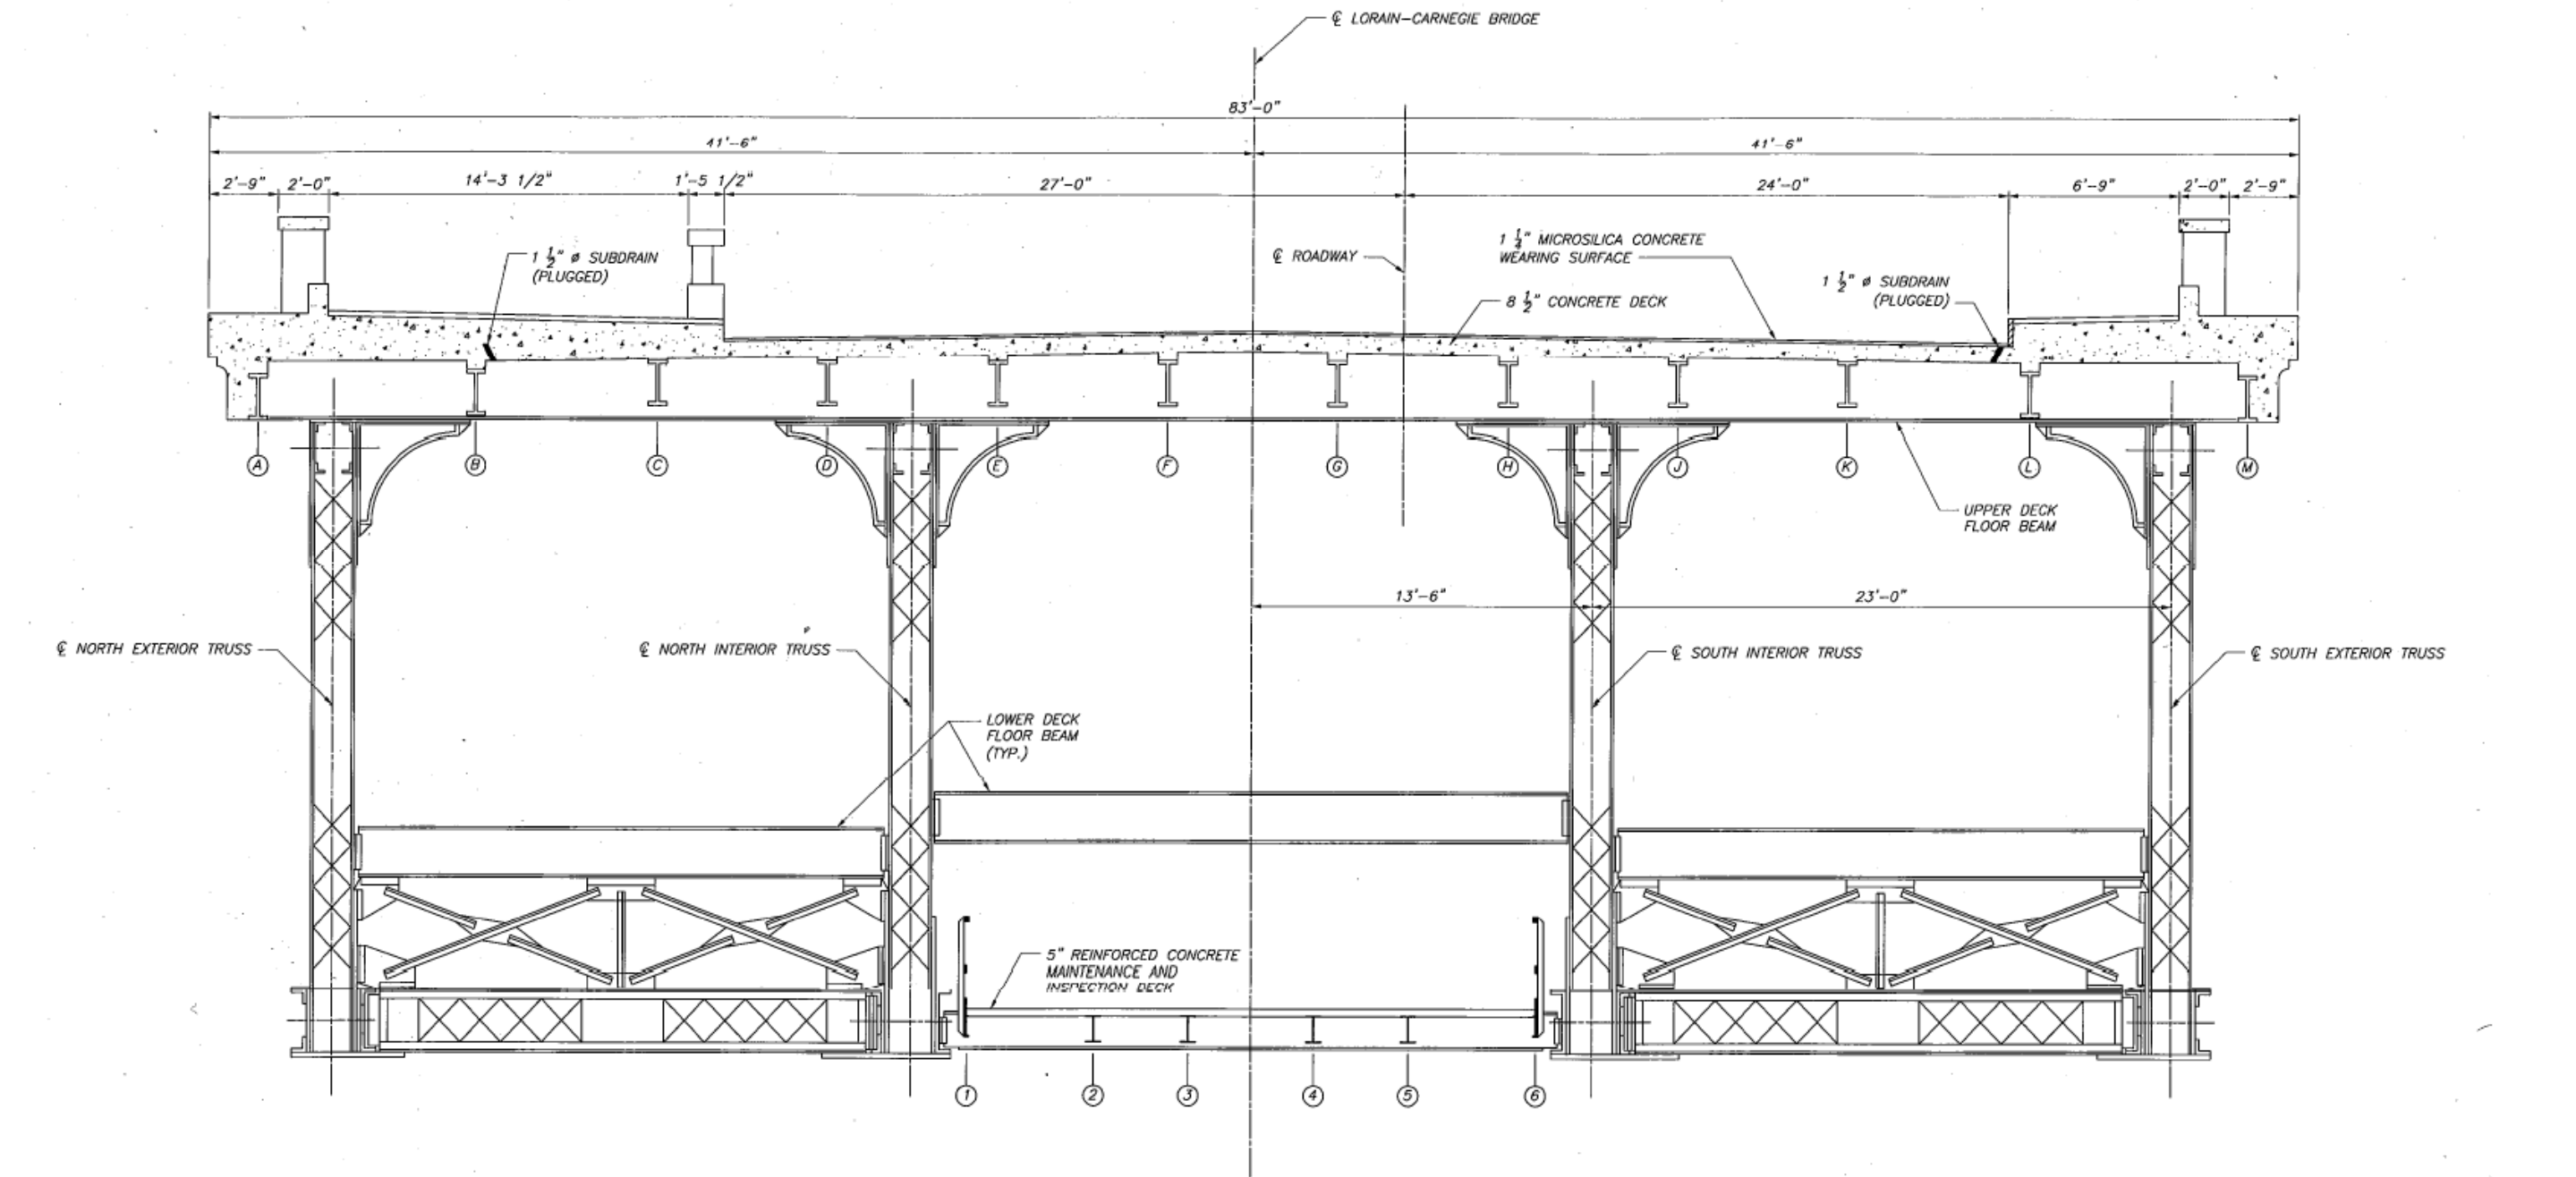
TRANSVERSE SECTION (MAIN SPANS)
